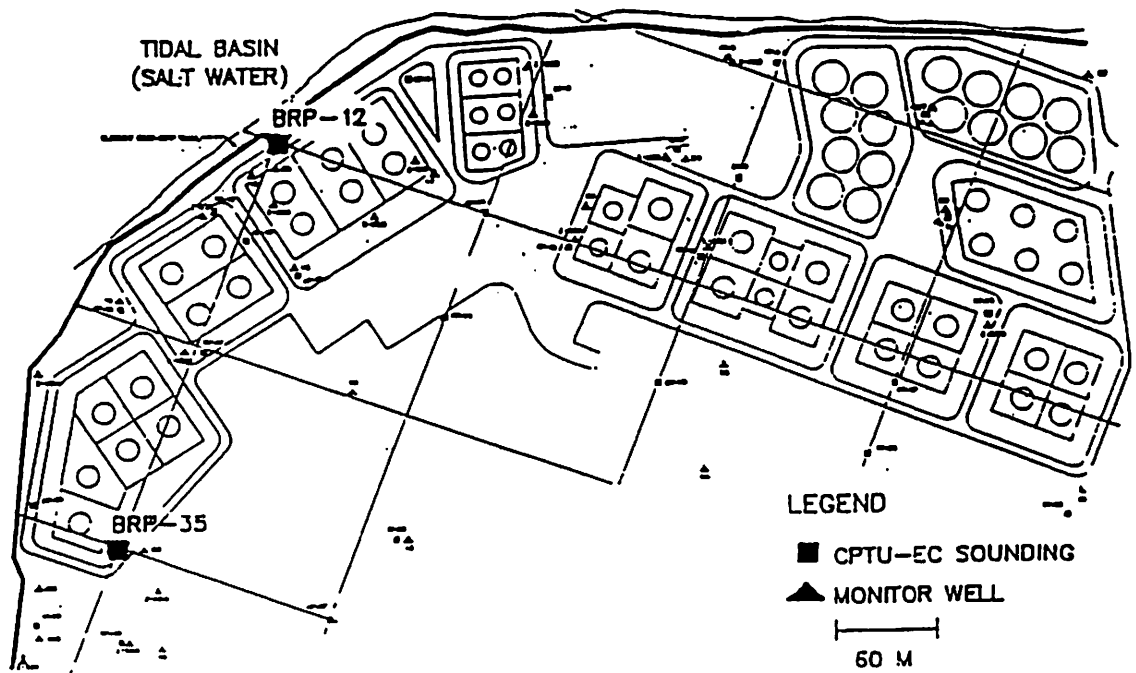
BULK FUEL FARM LOCATION PLAN
